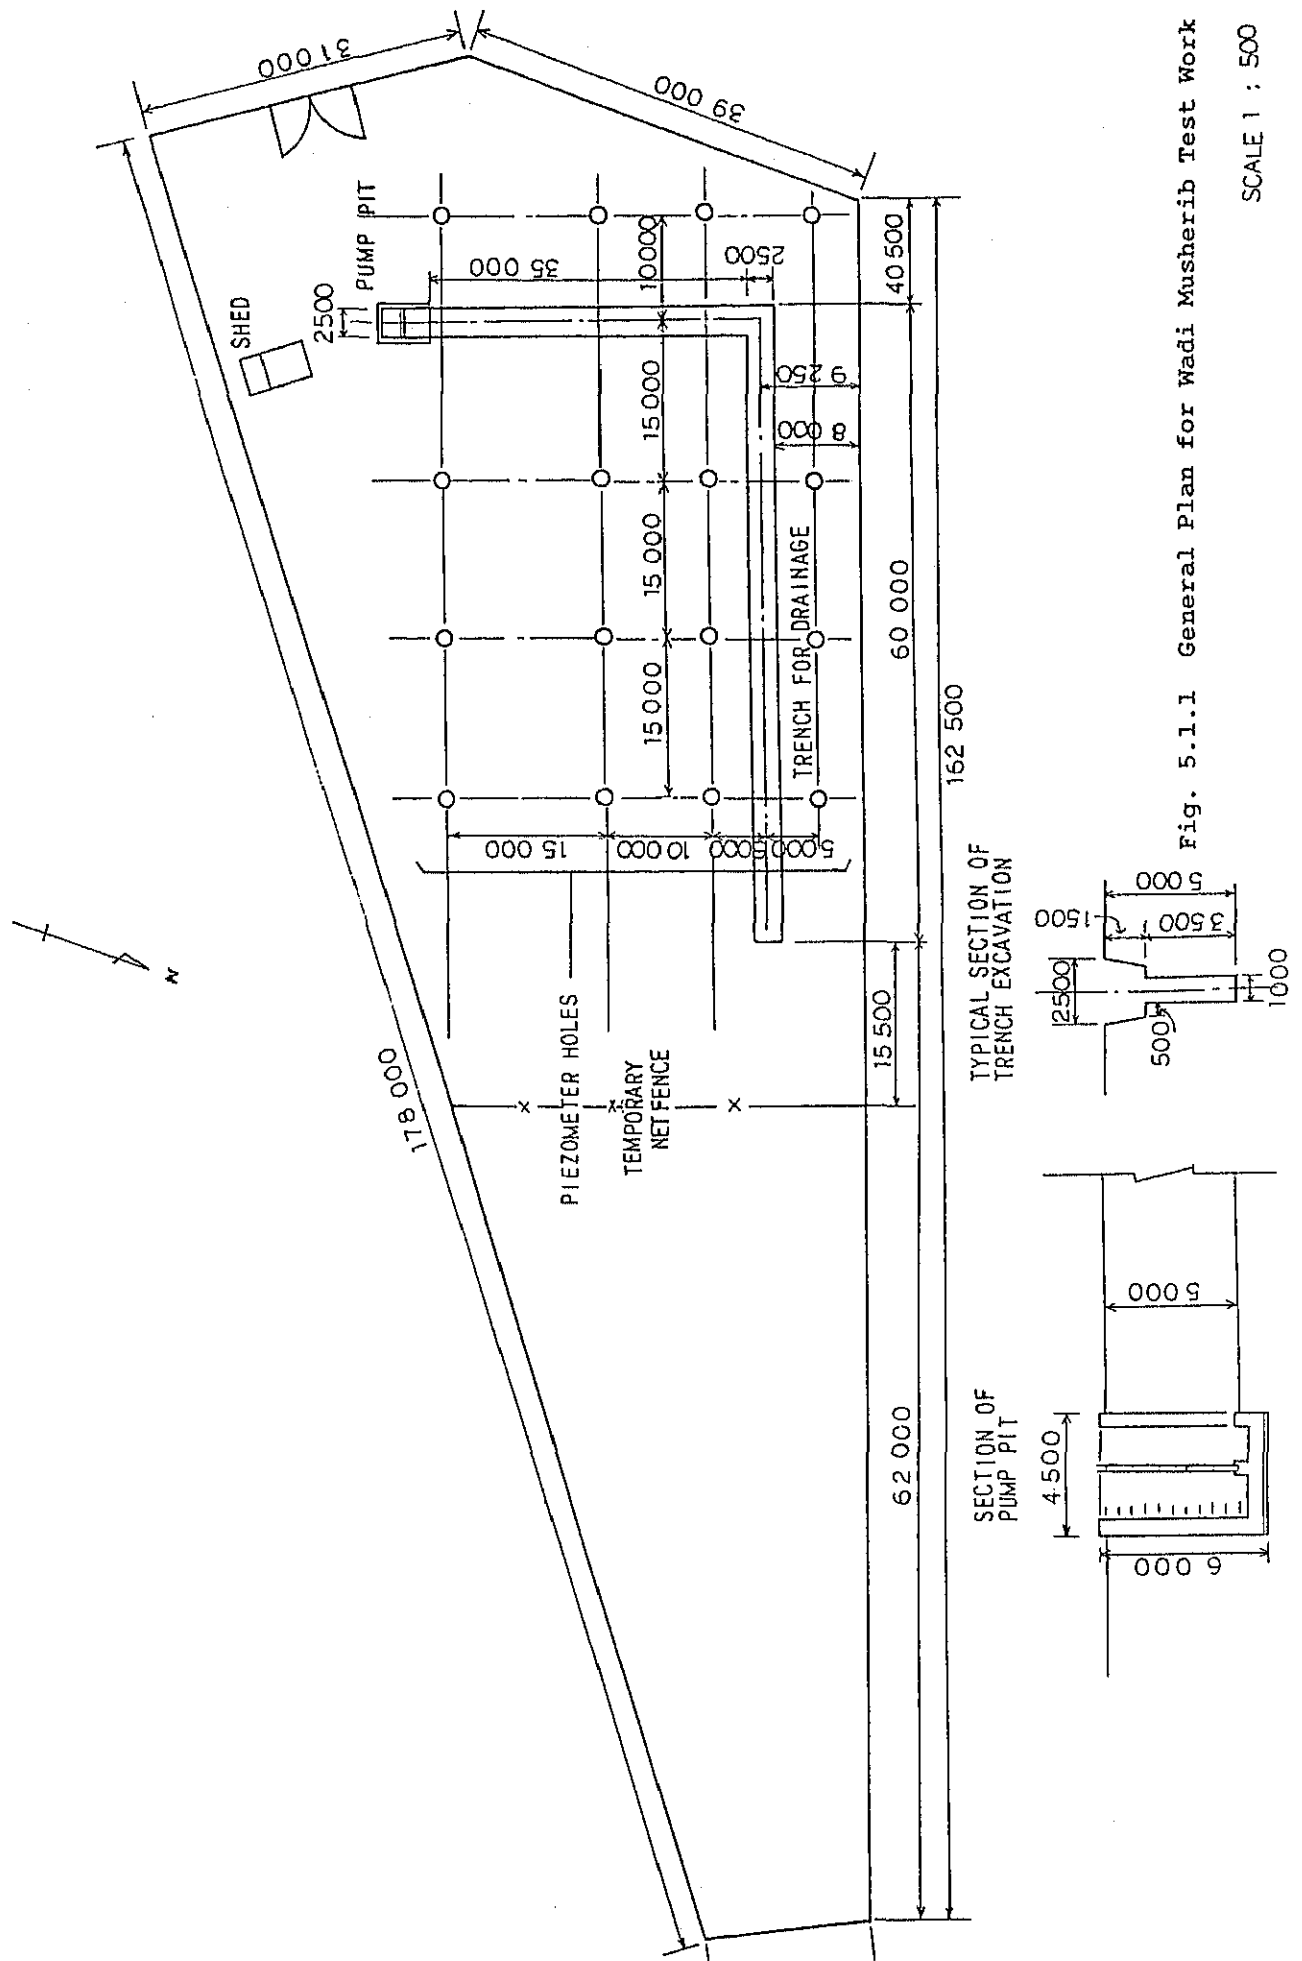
General Plan for Wadi Musherib Test Work
